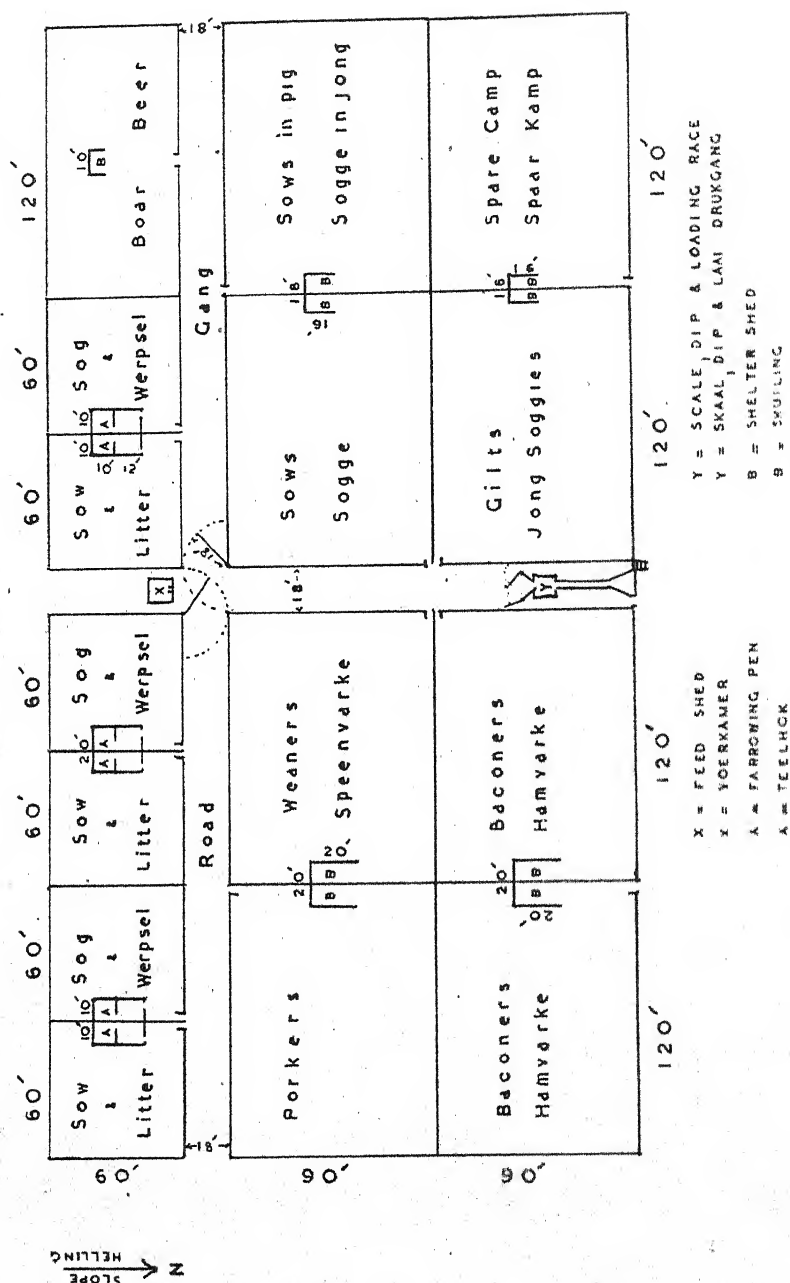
PLAN OF LAYOUT OF A SOUTH AFRICAN FARM.
